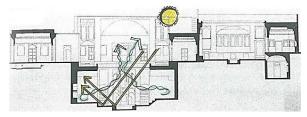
Natural lighting and ventilation through small garden pits (Oloumies' house) [15]
